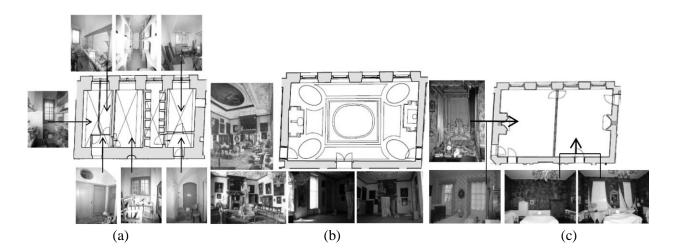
The floor plans used in the construction of the initial model; (a) the selected zone in the basement is divided into several rooms; (b) the Grand Salon at ground floor and its environment over time; (c) the selected zone at 1^{st} floor with the Lodewijk room on the left side and the resident room on the right side.
